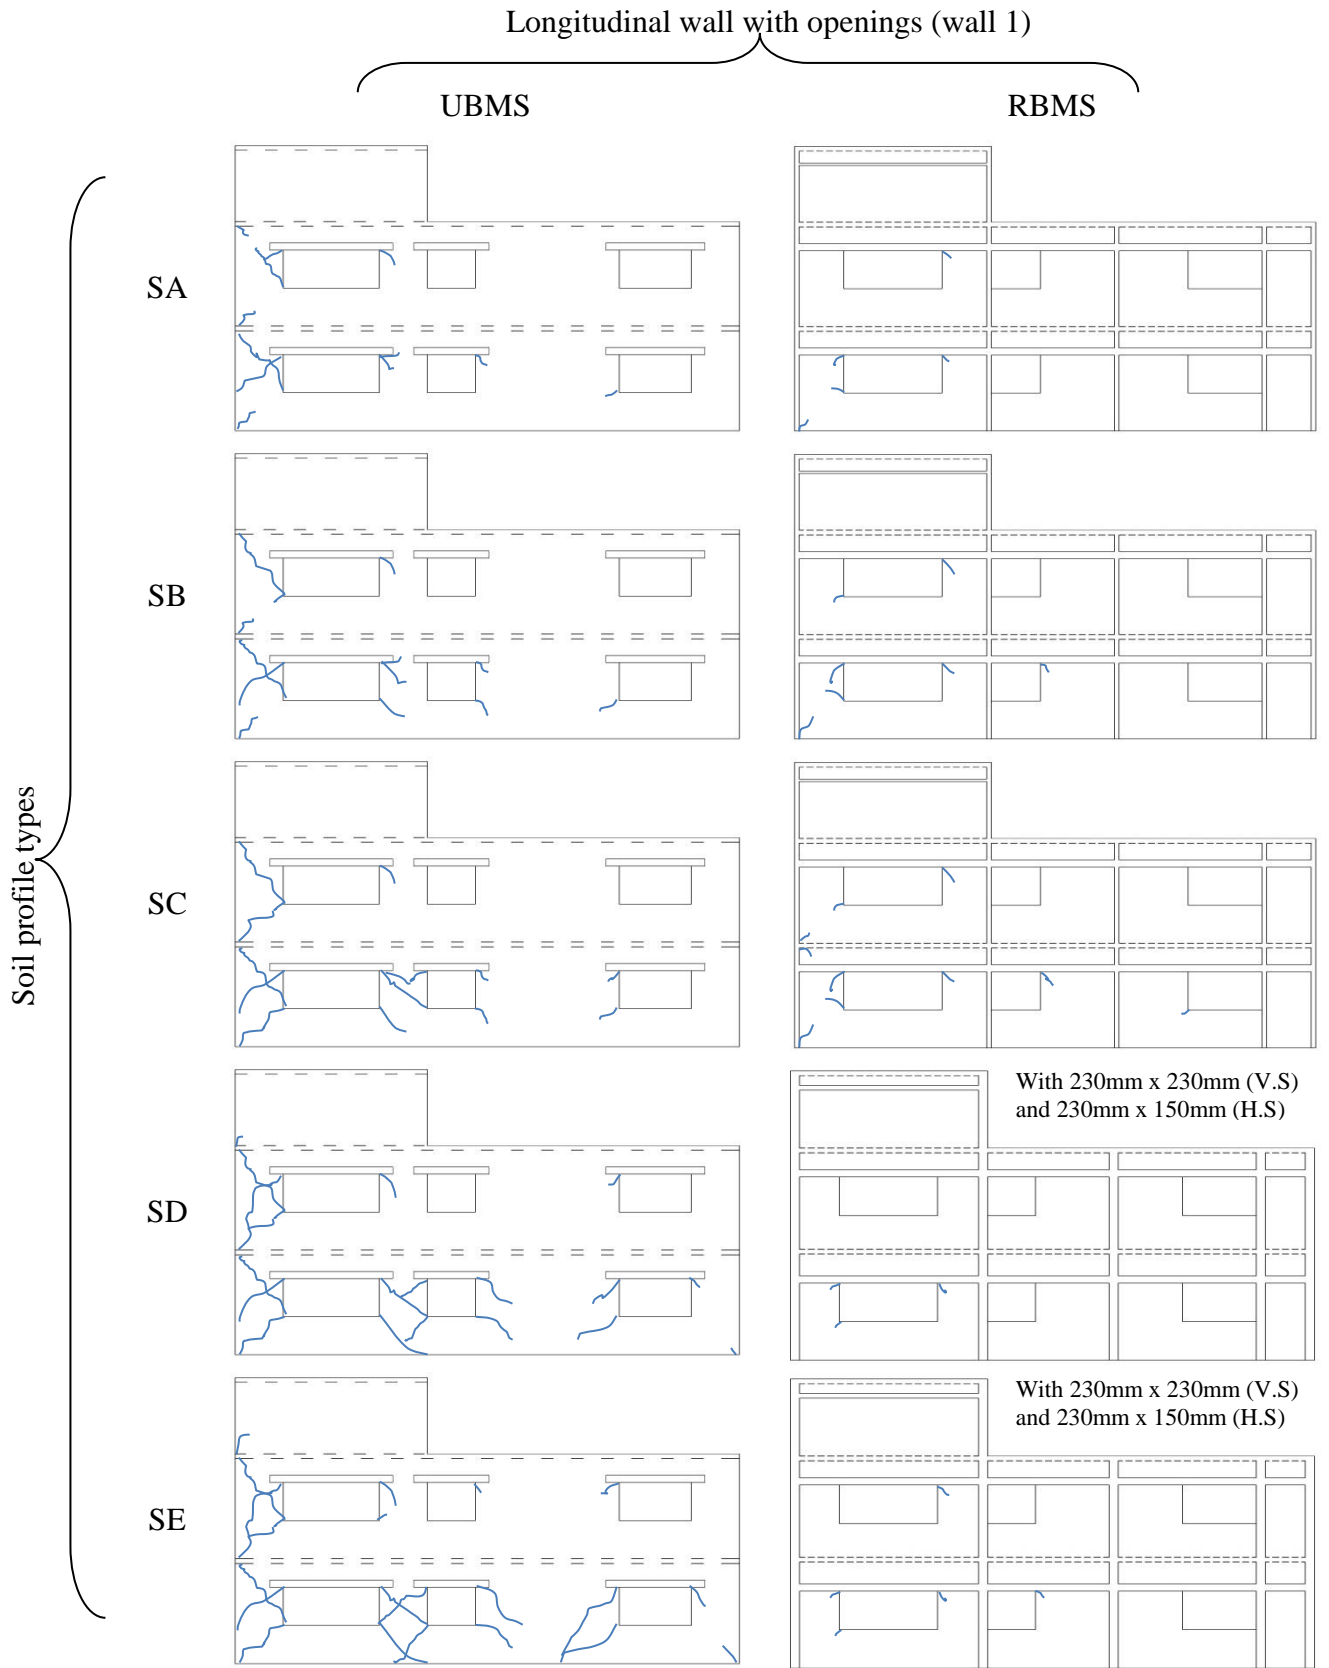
Prediction of crack propagation in longitudinal wall with openings i.e. wall 1 (viewed from inside) for seismic zone 2B and all soil profile types
